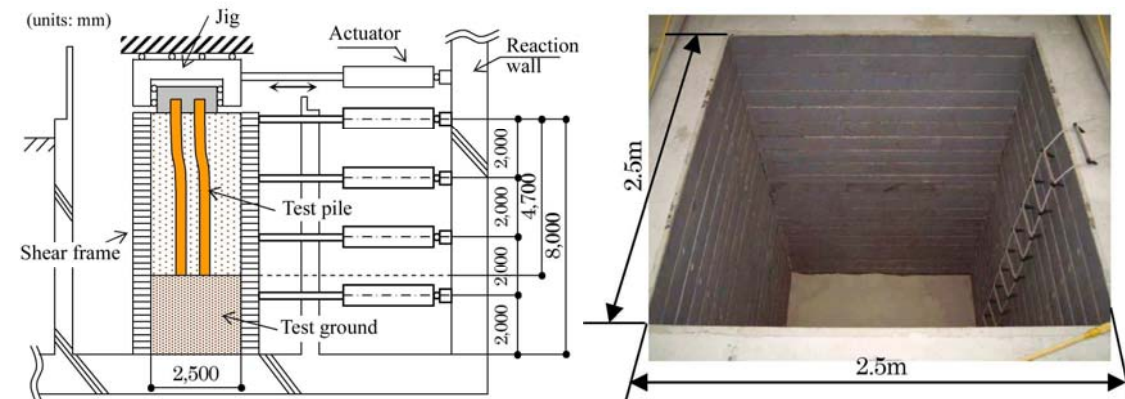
SET-UP OF LARGE SHEAR EARTH TANK
